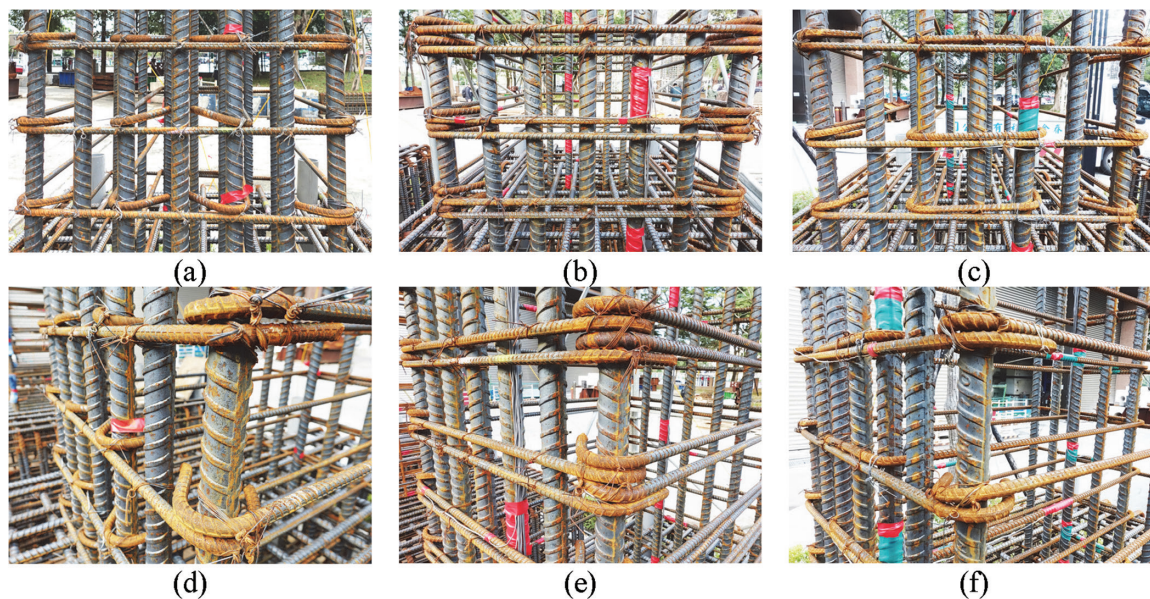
Photos of reinforcing bar cages: top side view of specimens (a) CH, (b) DPH, and (c) CSH; and top-corner side view of specimens (d) CH, (e) DPH, and (f) CSH.
